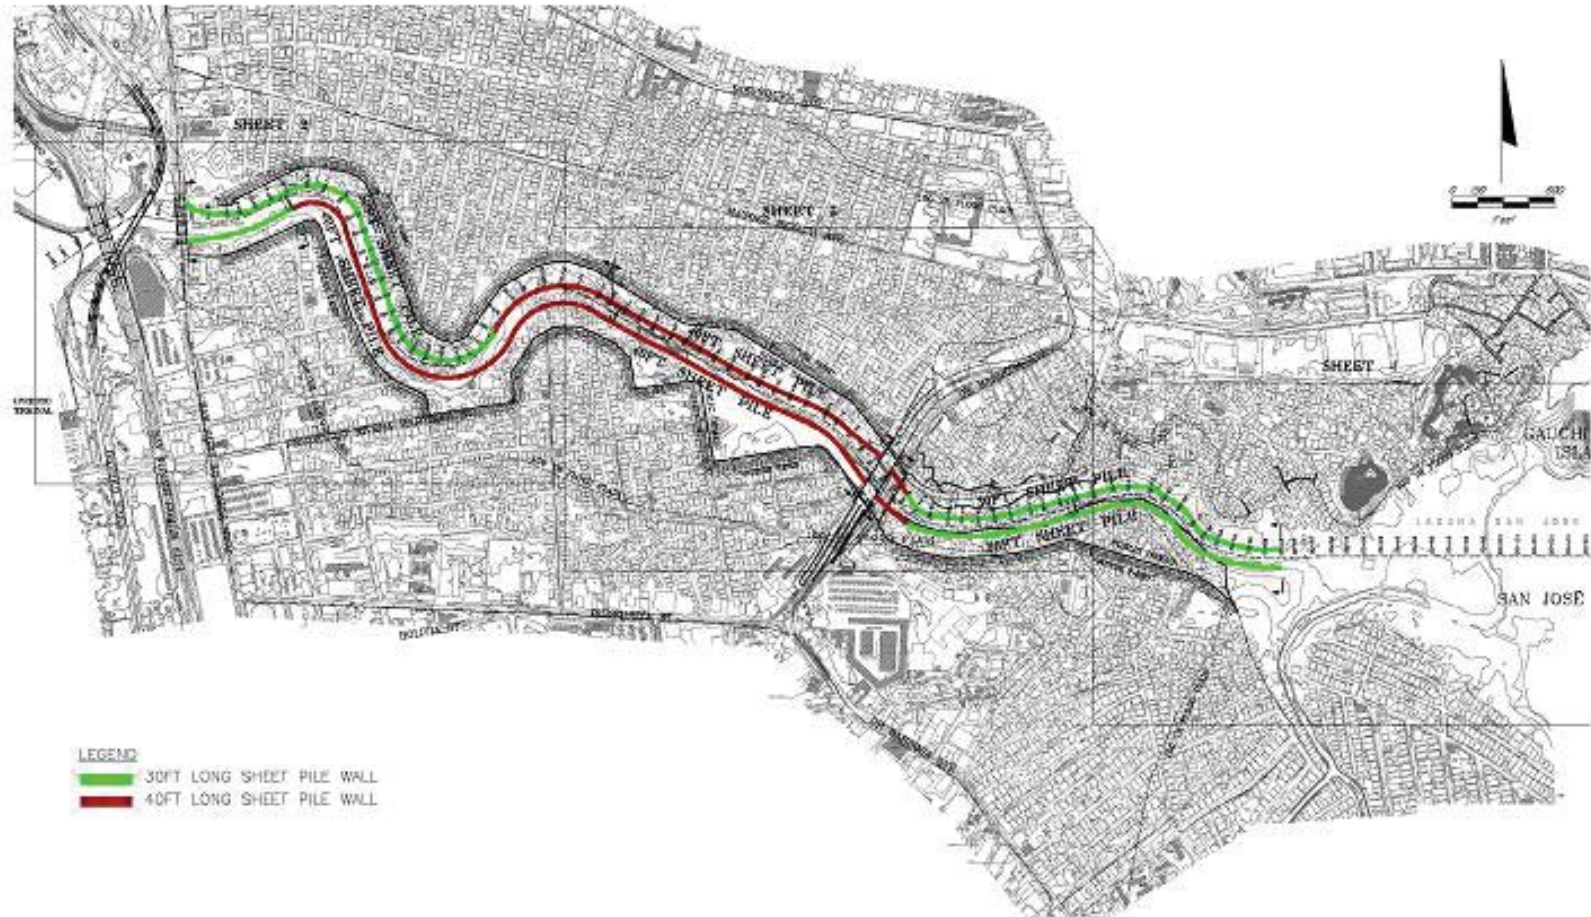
Sheet Pile Wall Layout, 10-foot-deep Channel
